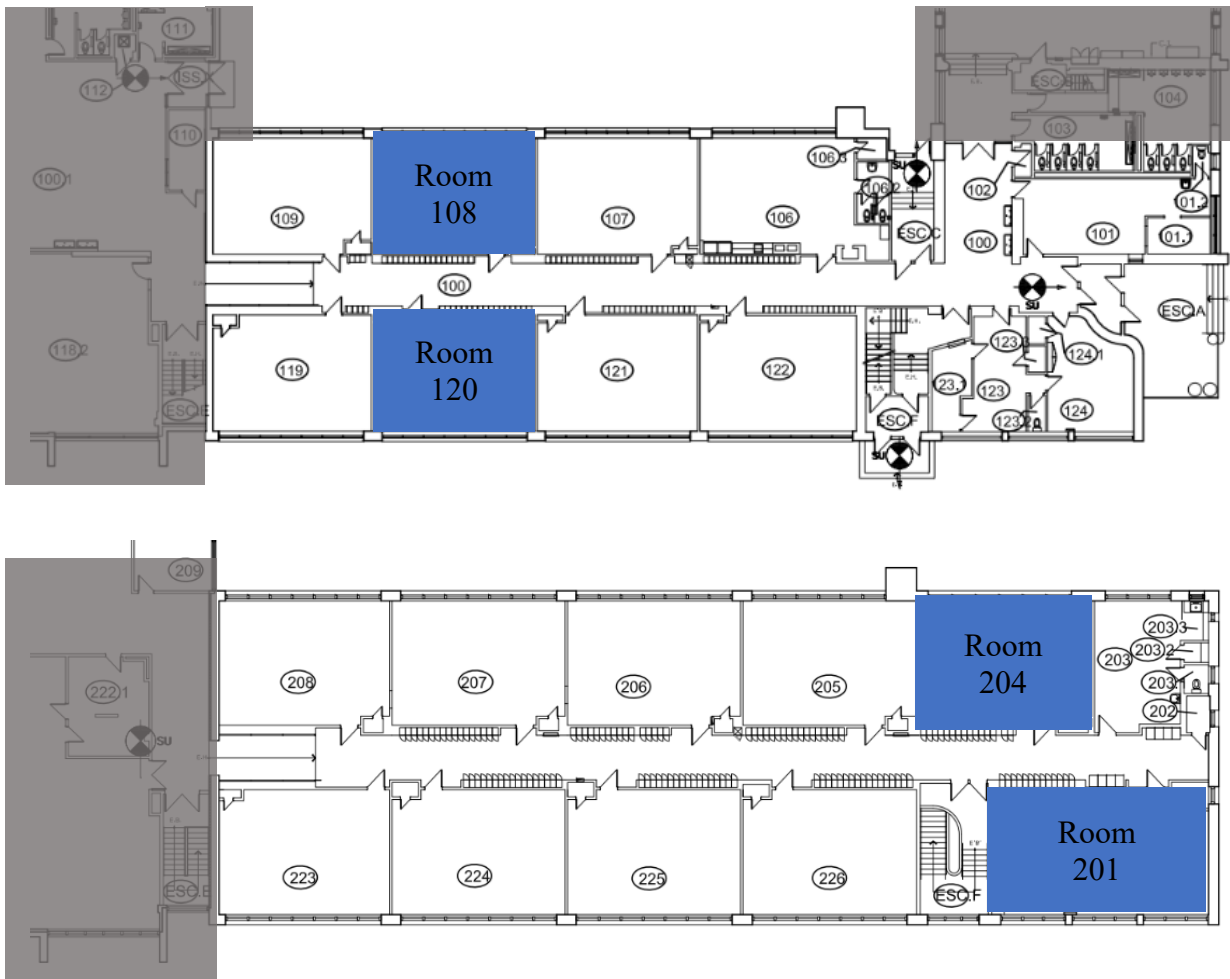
Plan view School 2 of first floor (top) and second floor (bottom)
